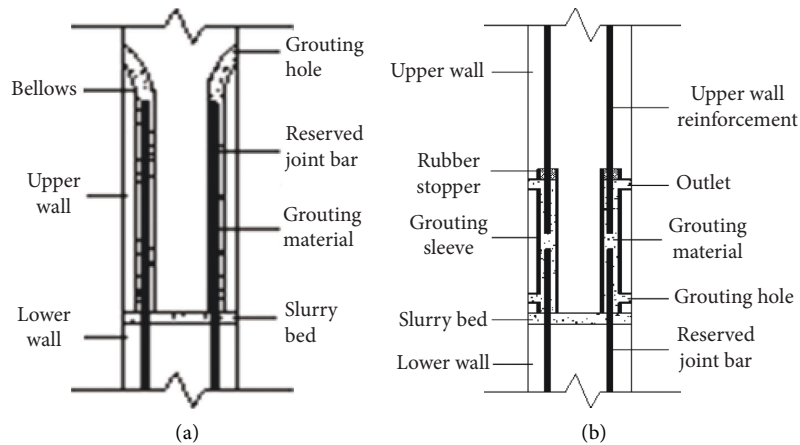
Bolt connection form of specimen. (a) Bellows grout anchor connection. (b) Sleeve grout anchor connection.
